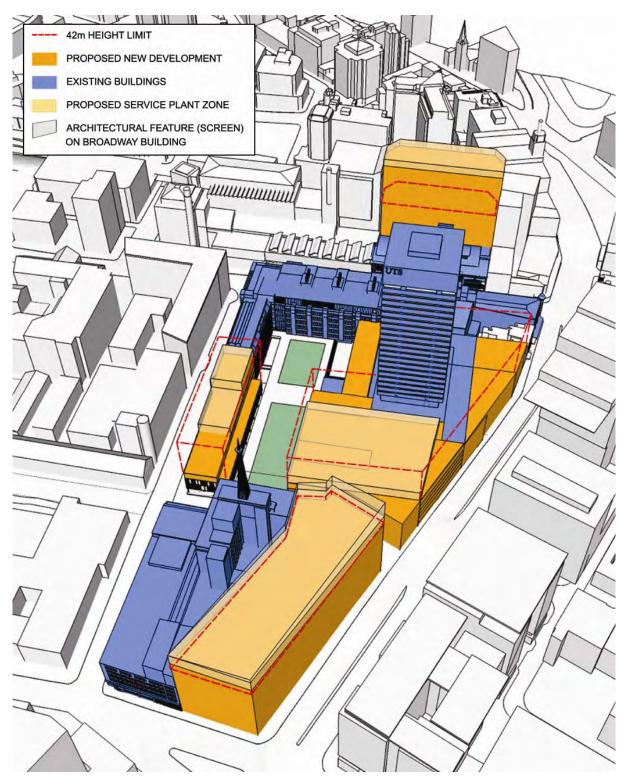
Building envelope in relation to SLEP 2005 height limit (Source: BVN and DCM)
